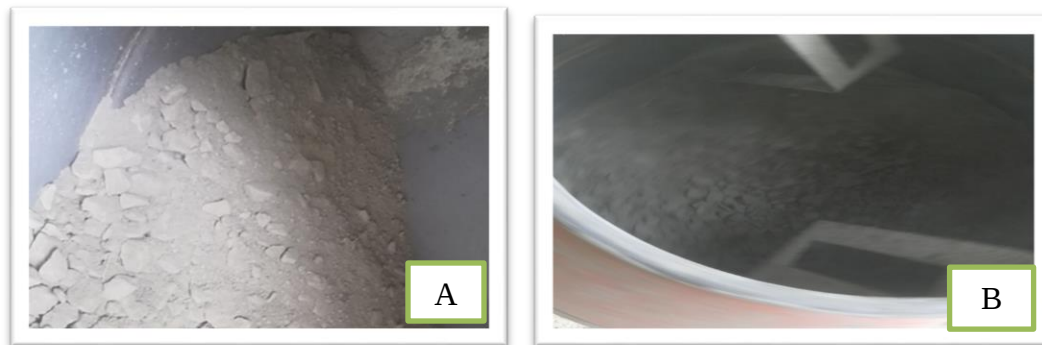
8 Concrete Mixing: - (A) Dry Mix, (B) Wet mix
